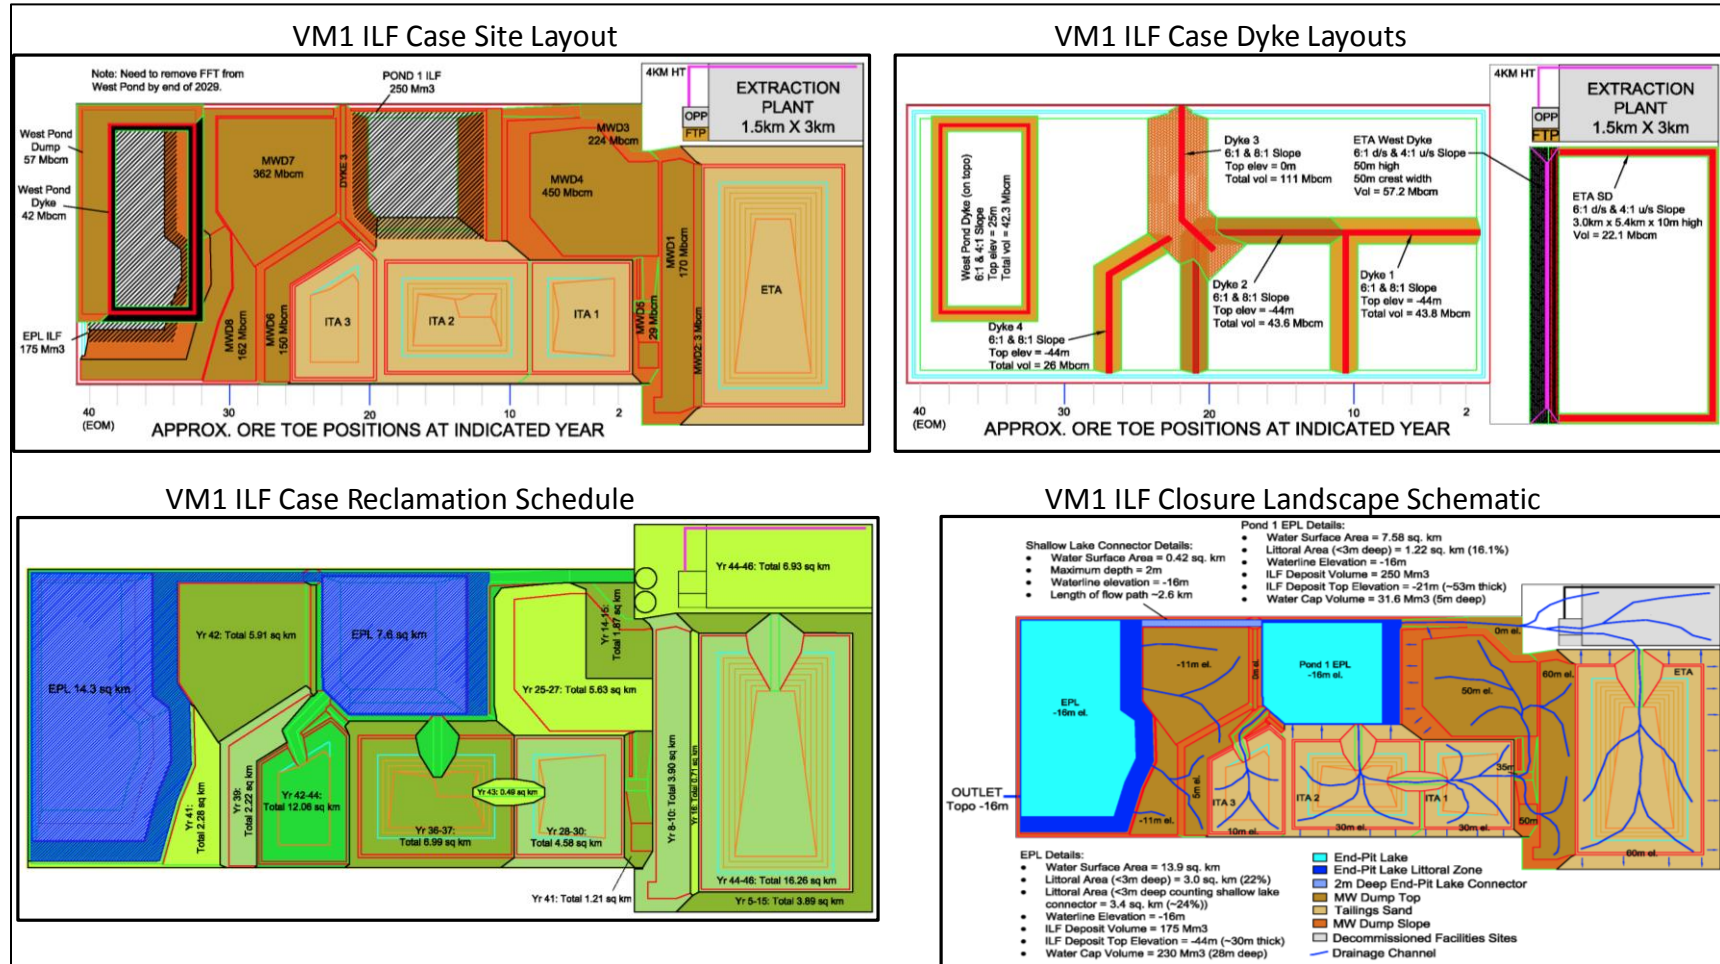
Site Layout and Progression to Closure for VM1 ILF Case
